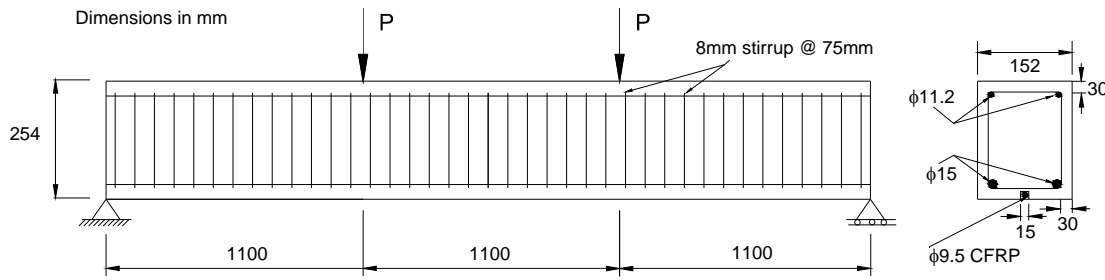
Loading and support conditions, geometry, and reinforcement details of a pre-stressed beam (Badawi and Soudki, 2009).
